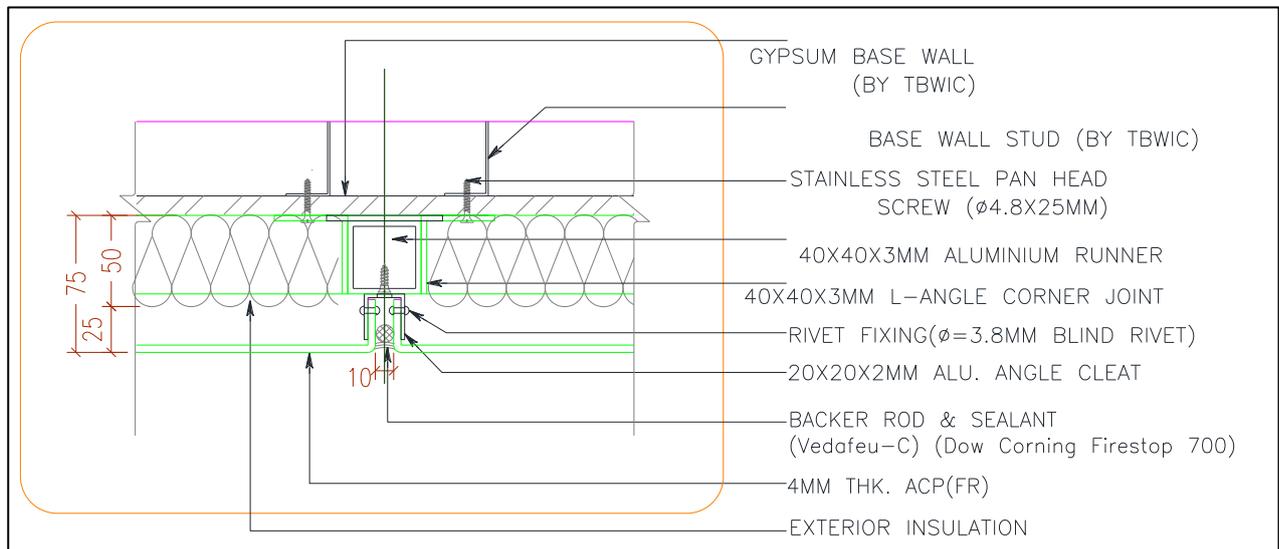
Horizontal section of the specimen along the mid-height of the specimen.
